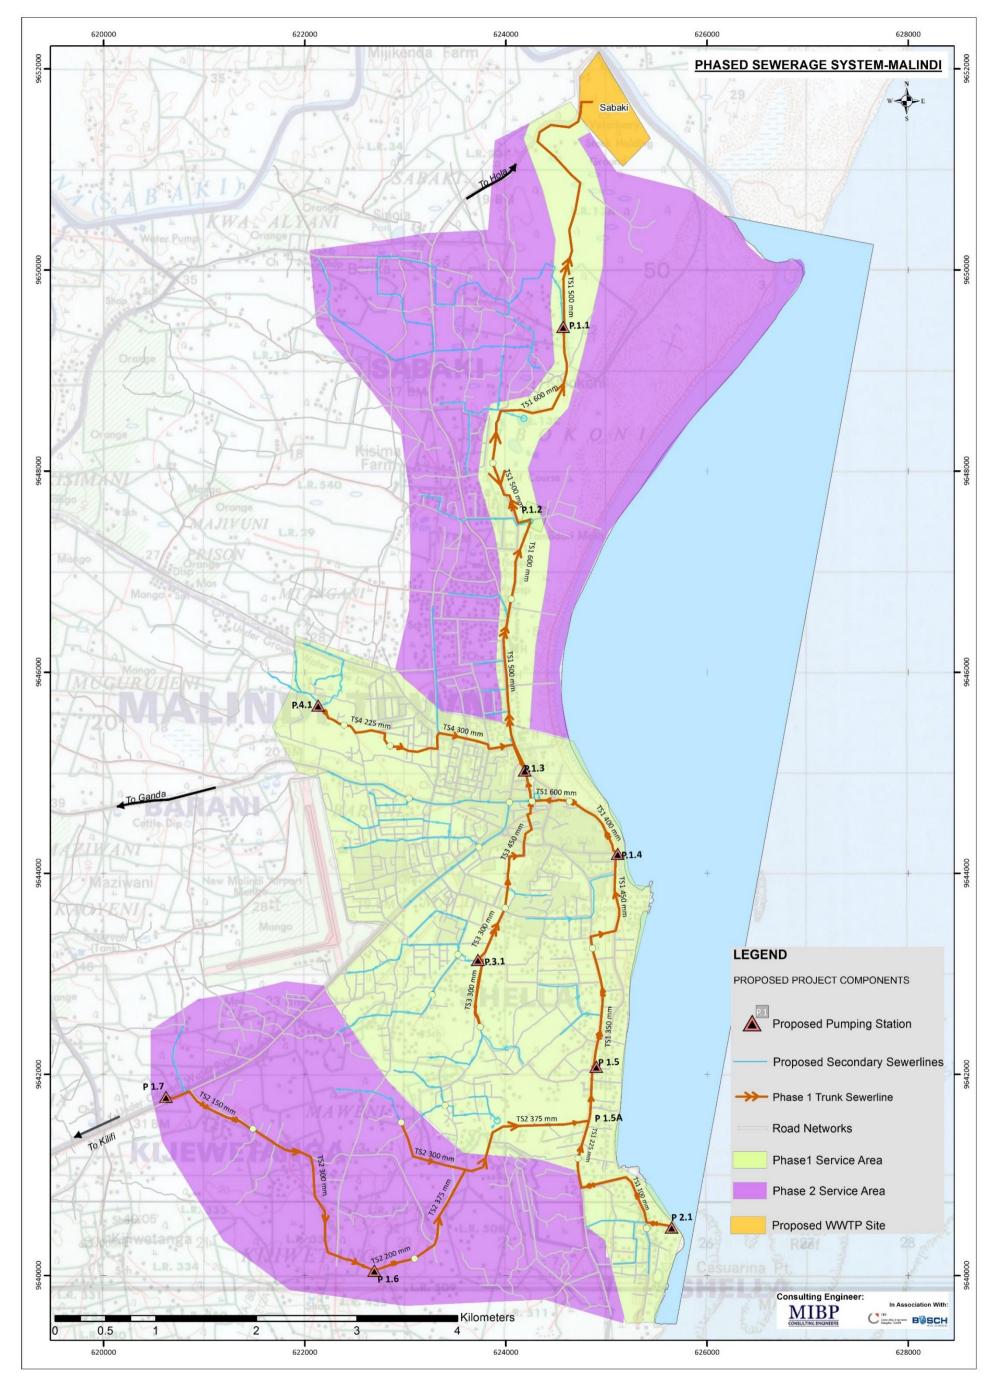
Layout Plan of the Phased Implementation of Sewerage System
